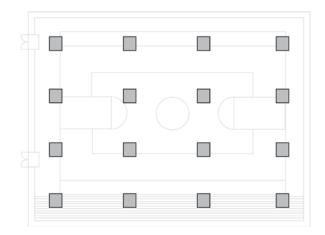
Typical 7600 ft<sup>2</sup> gymnasium floor plan with skylights.
